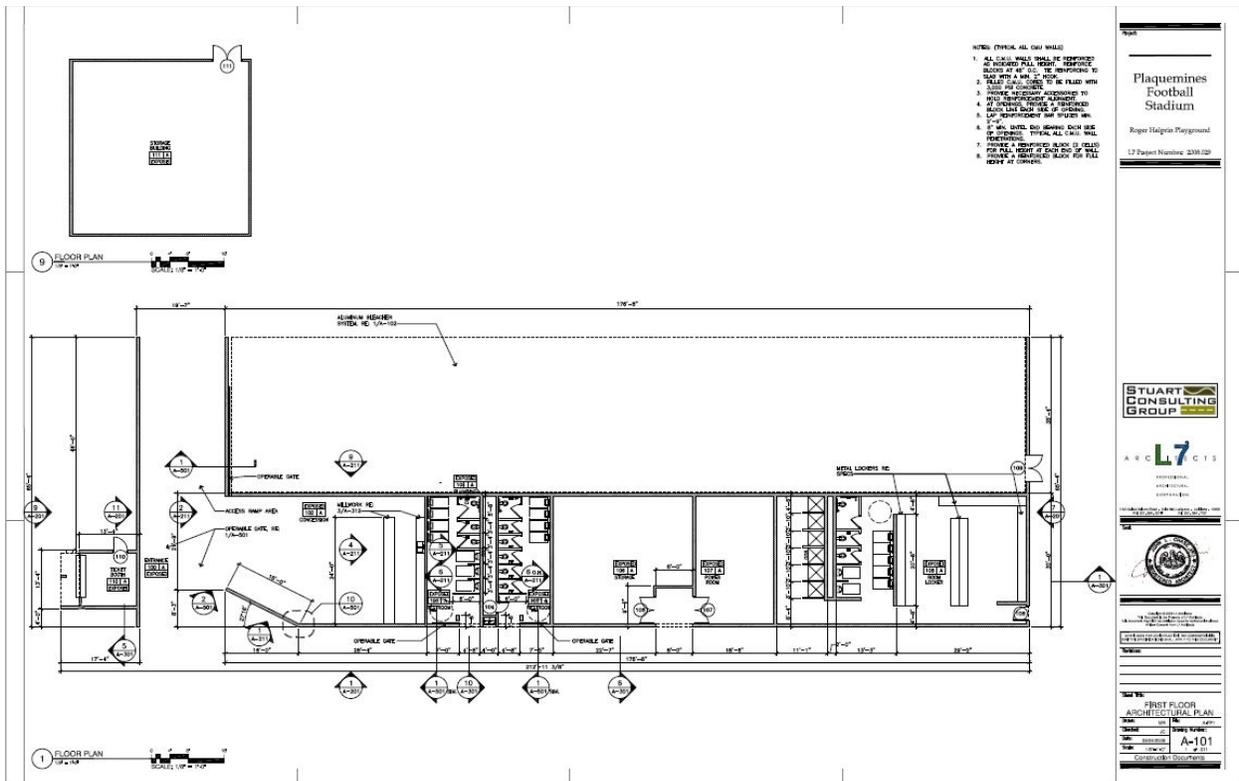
Site Plan for Bleachers, Storage Building, Ticket Booth, and Lockers
